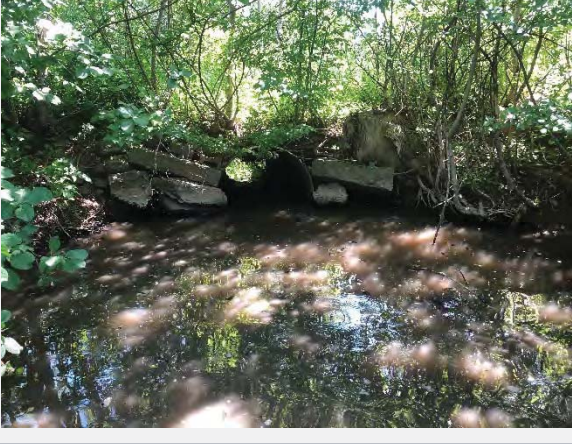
17 June 2021. Fruitland Road culvert outlet. Standing water conditions (1 mm deep and with no observable flow).
